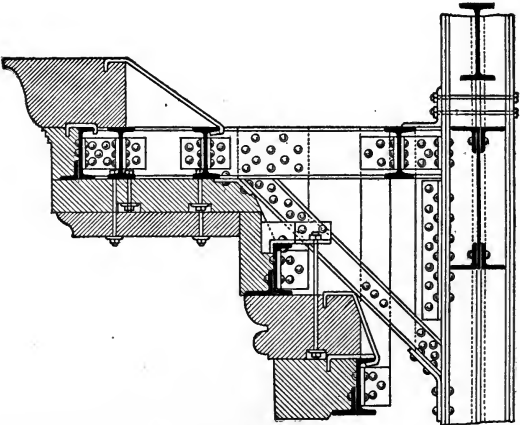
Spandrel Section, Fifteenth Floor. Spreckels Building, San Francisco.
